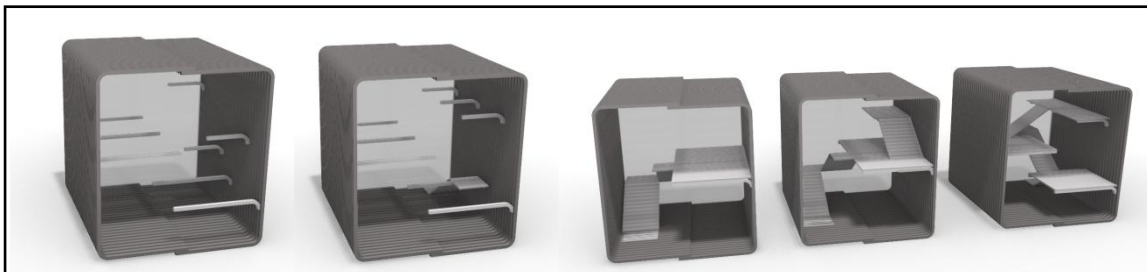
Setting carcass to put the floors on, and installing the components like floors and stairs
